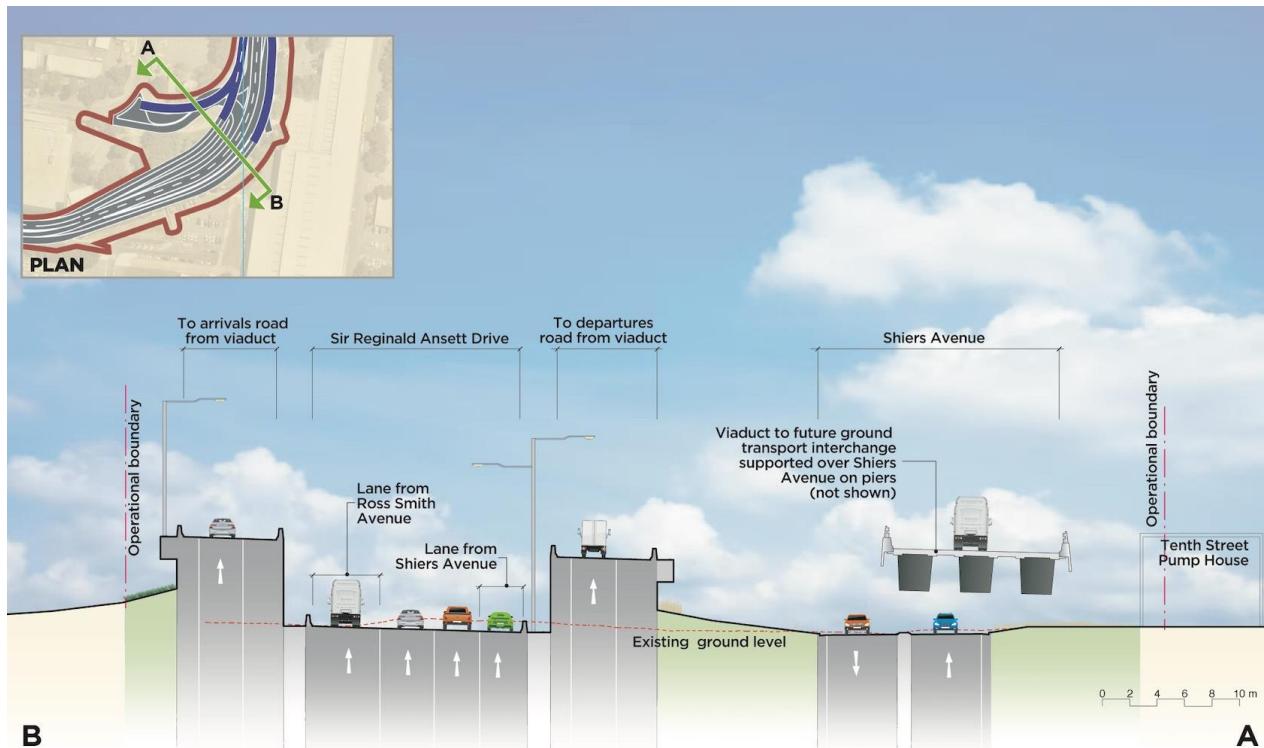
Terminals 2/3 access at ramp structure along Sir Reginald Ansett Drive north of Shiers Avenue – typical cross-section (looking south)
